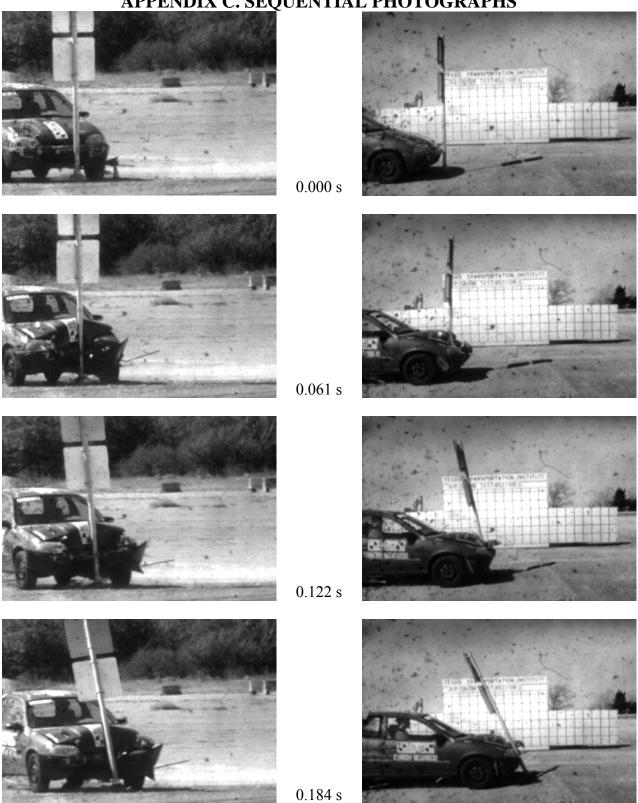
Sequential Photographs for Test 452108-1 (Oblique and Perpendicular Views).
